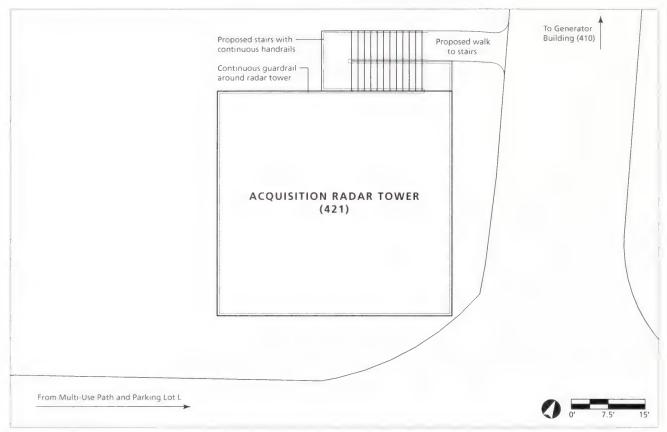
Plan of proposed access stairs to acquisition radar tower (Building 421), NIKE radar site. The proposed stairs should be located on the north side of the platform where they will be less conspicuous for visitors viewing the site from the parking lot and multiuse path to the west (Olmsted Center, 2009).
